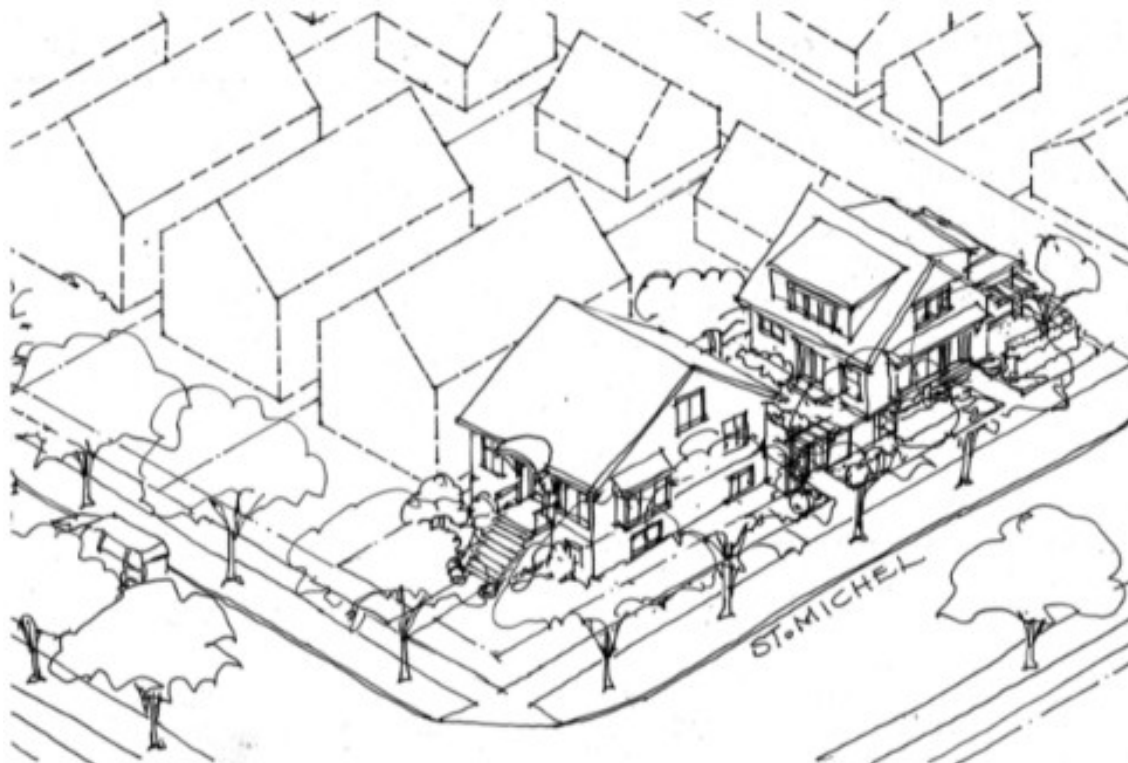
Example of Detached Duplex Dwelling Unit on a corner lot.
